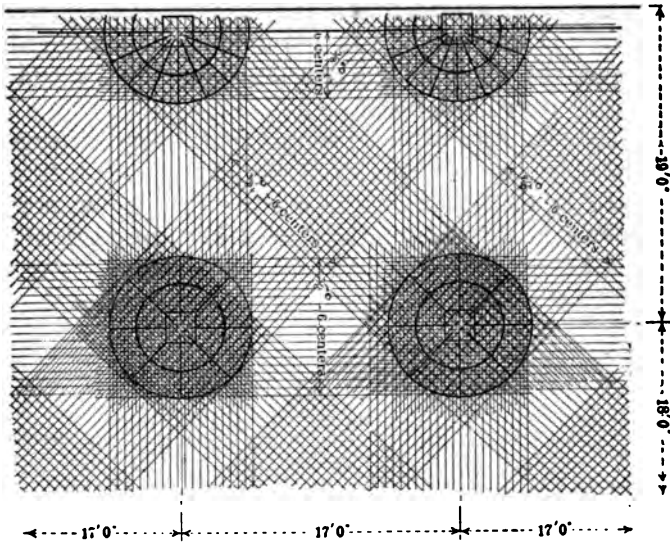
Floor Slab Reinforcement in Mushroom System of Construction.
